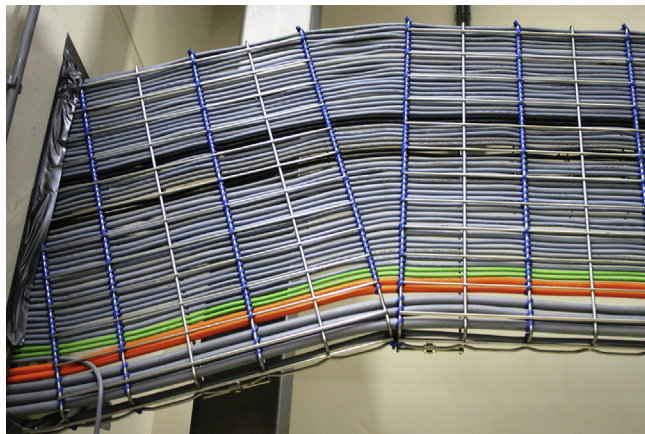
It is recommended to lay the cables separated from each other to make cleaning operations easier. When cables pass from one hygiene zone to another, care should be taken to avoid the formation of pest ingress channels. Cable binders do not facilitate the cleanability. Courtesy VEZOR media, publisher Solids Processing Benelux.
